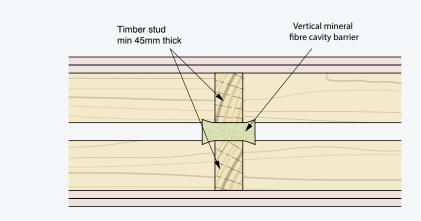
Intermediate vertical cavity barrier in double stud wall. Cavity barrier stud thickness needs to be increased to 60 mm if this detail is to be applied for FRLs greater than 90/90/90.
